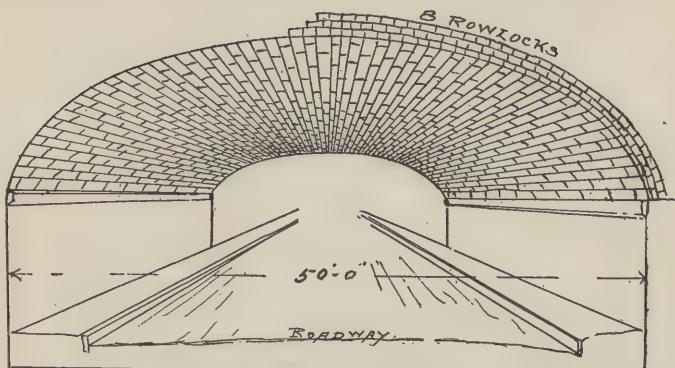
SECTION OF BRICK ARCH OVER 86TH STREET TRANSVERSE ROAD, CENTRAL PARK, N. Y. CITY.
